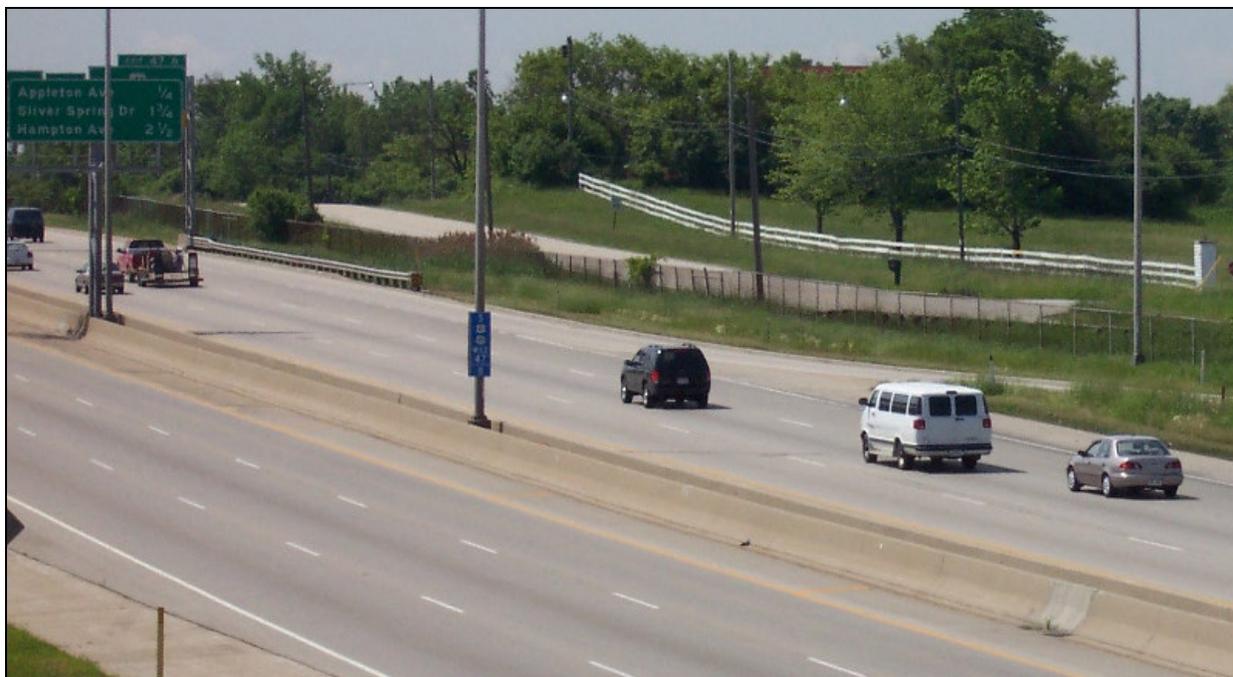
Typical Concrete Barrier on a Narrow Median Highway.
